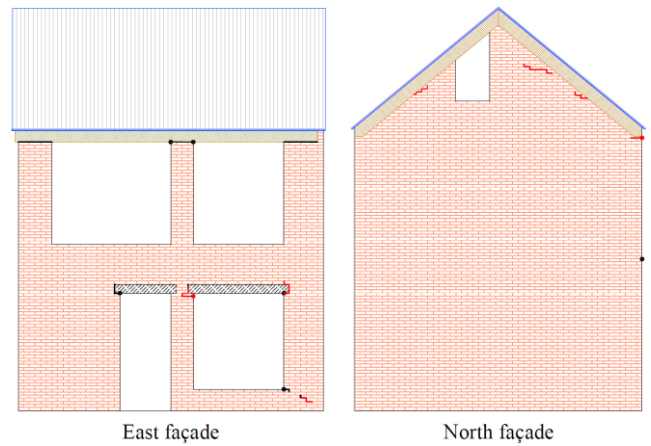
Retrofitted building crack pattern after EQ-NPR-100%: clay external veneers.
